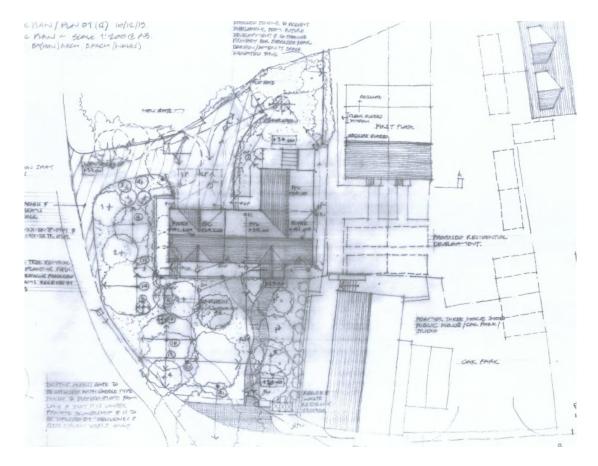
Proposed Tree Planting Scheme and Site Layout:
